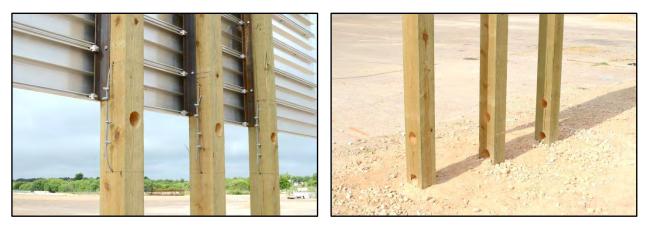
Modified Direct Embedded Wood Support Temporary Guide Sign System before Test Nos. 467823-2b and 467823-3.
